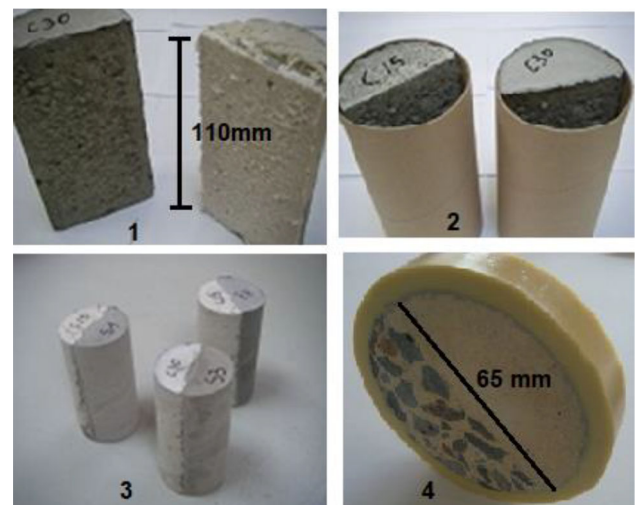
Manufacturing process of mixed cylindrical samples with mortar–concrete interface
